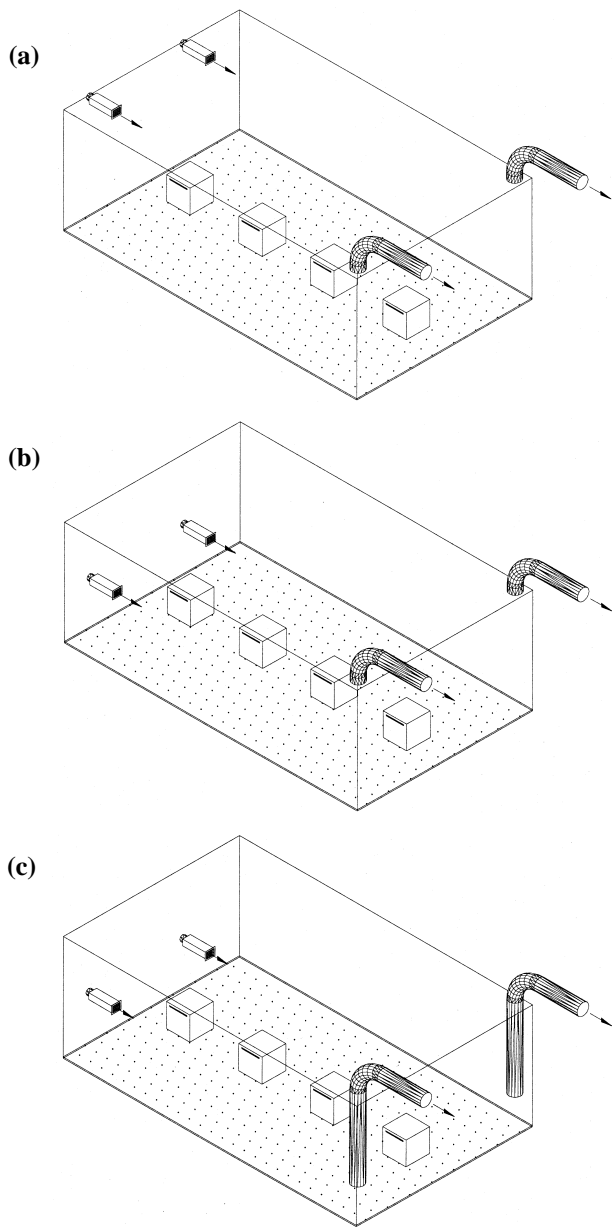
Single wall configuration. (a) Single wall grille, high-high; (b) single wall grille, low-high; (c) single wall grille, low-low.
